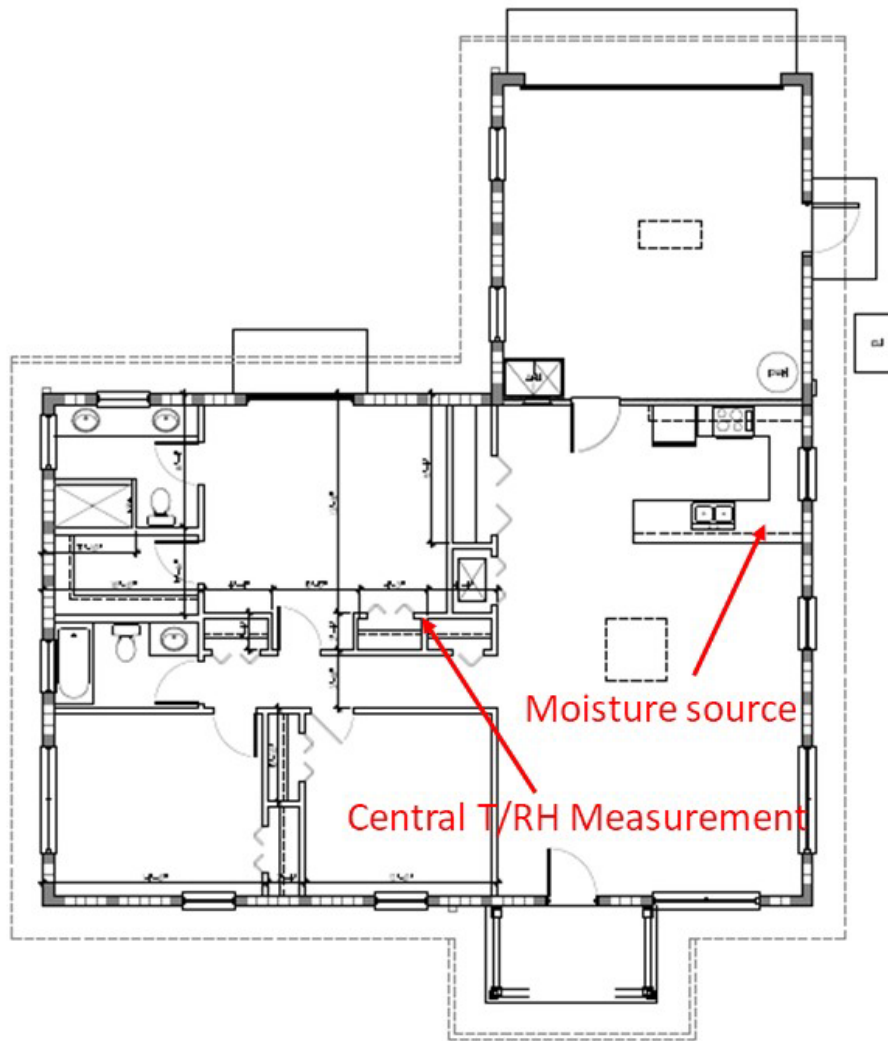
FRTF floor plan showing location of internal moisture source and indoor T/RH measurement (interior walls not present in lab).
